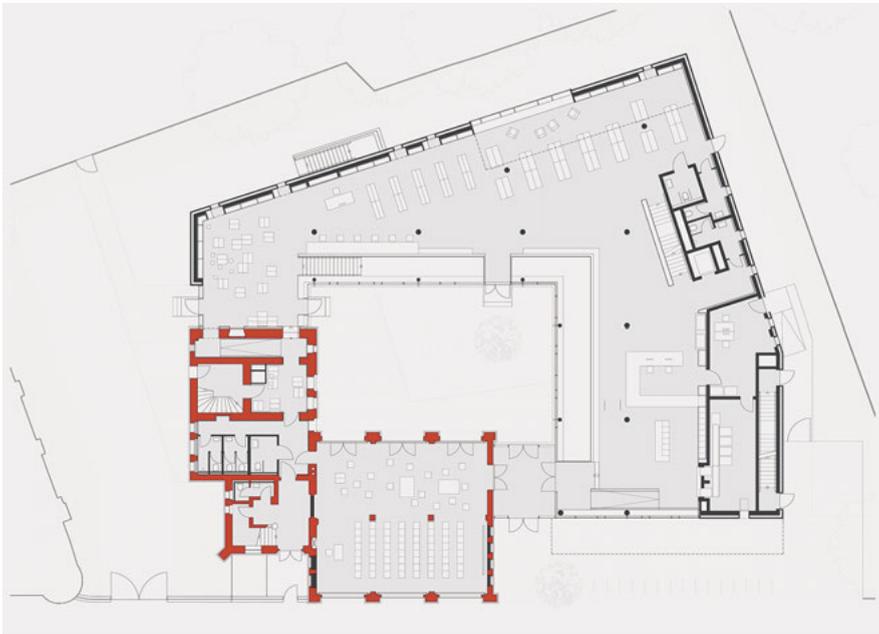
Ground floor plan of the library with the existing structure shown in red and the extension in black. © Chestnutt-Niess Architekten.
